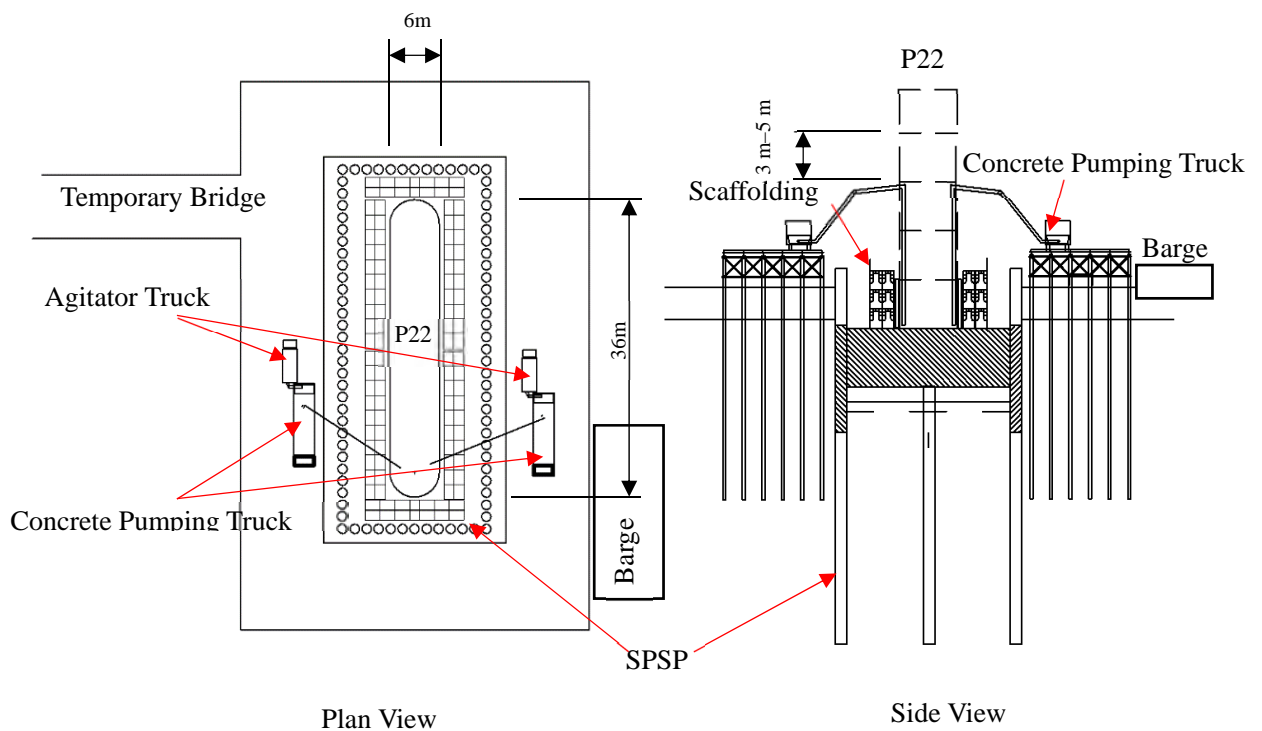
Reference Drawing for Pouring of Pier Concrete at P22
